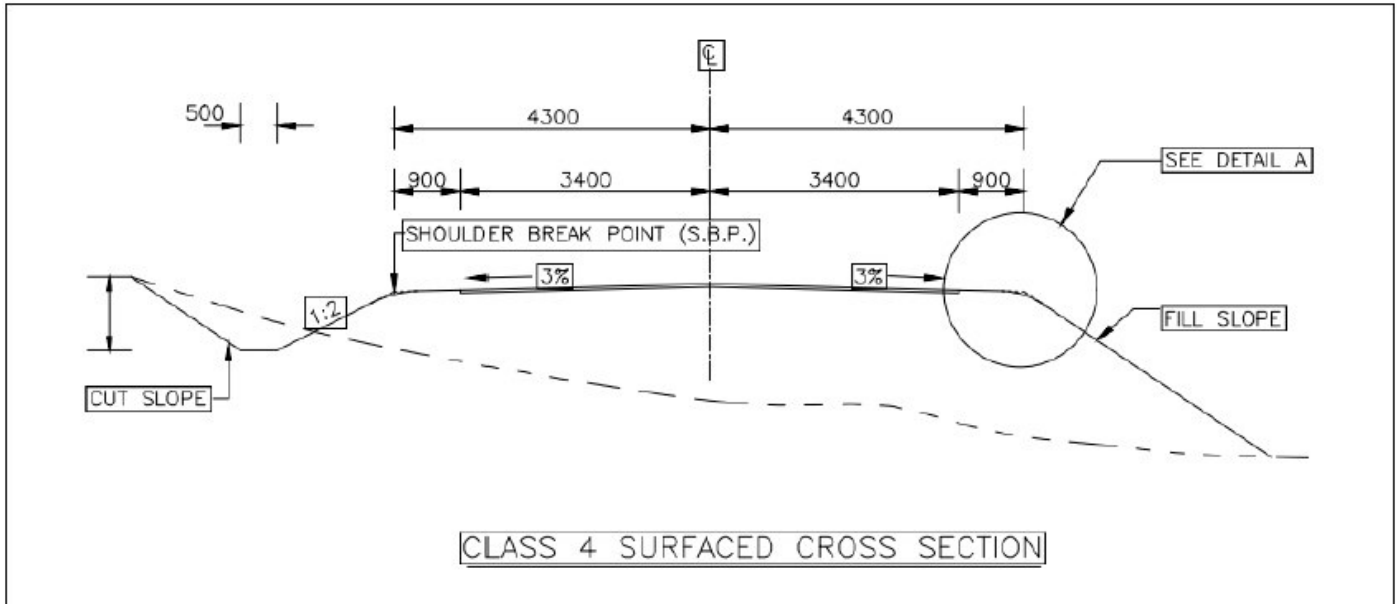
Typical cross-section for Class 4 low-volume sealed road (image obtained from the TIA)
